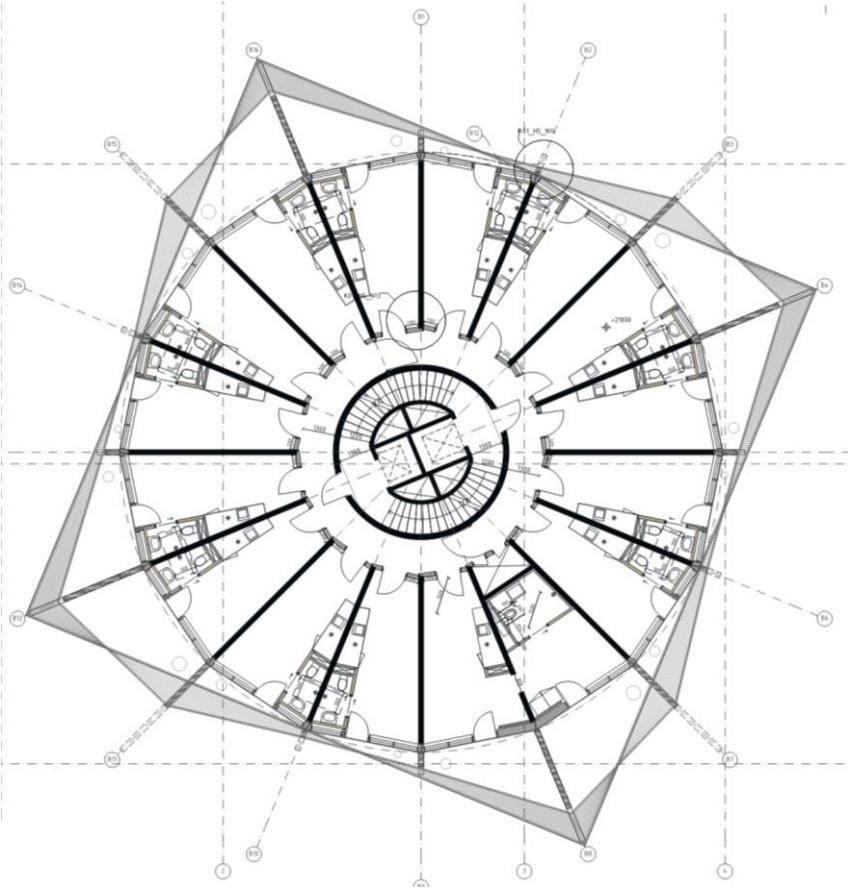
A Place To – Architectural impression, typical floorplates © BIG
